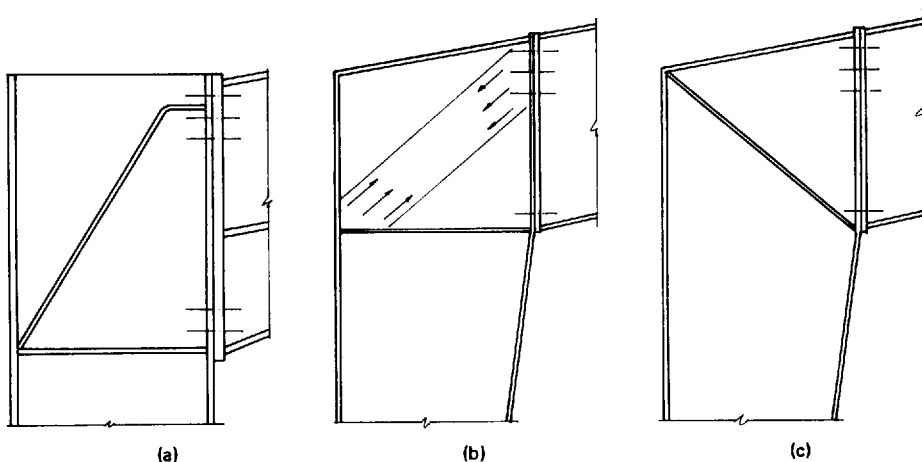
Stiffening arrangements for eaves connections. (a) Morris stiffeners for haunched connection; (b) horizontal stiffener for fabricated sections; (c) diagonal stiffener for fabricated sections
